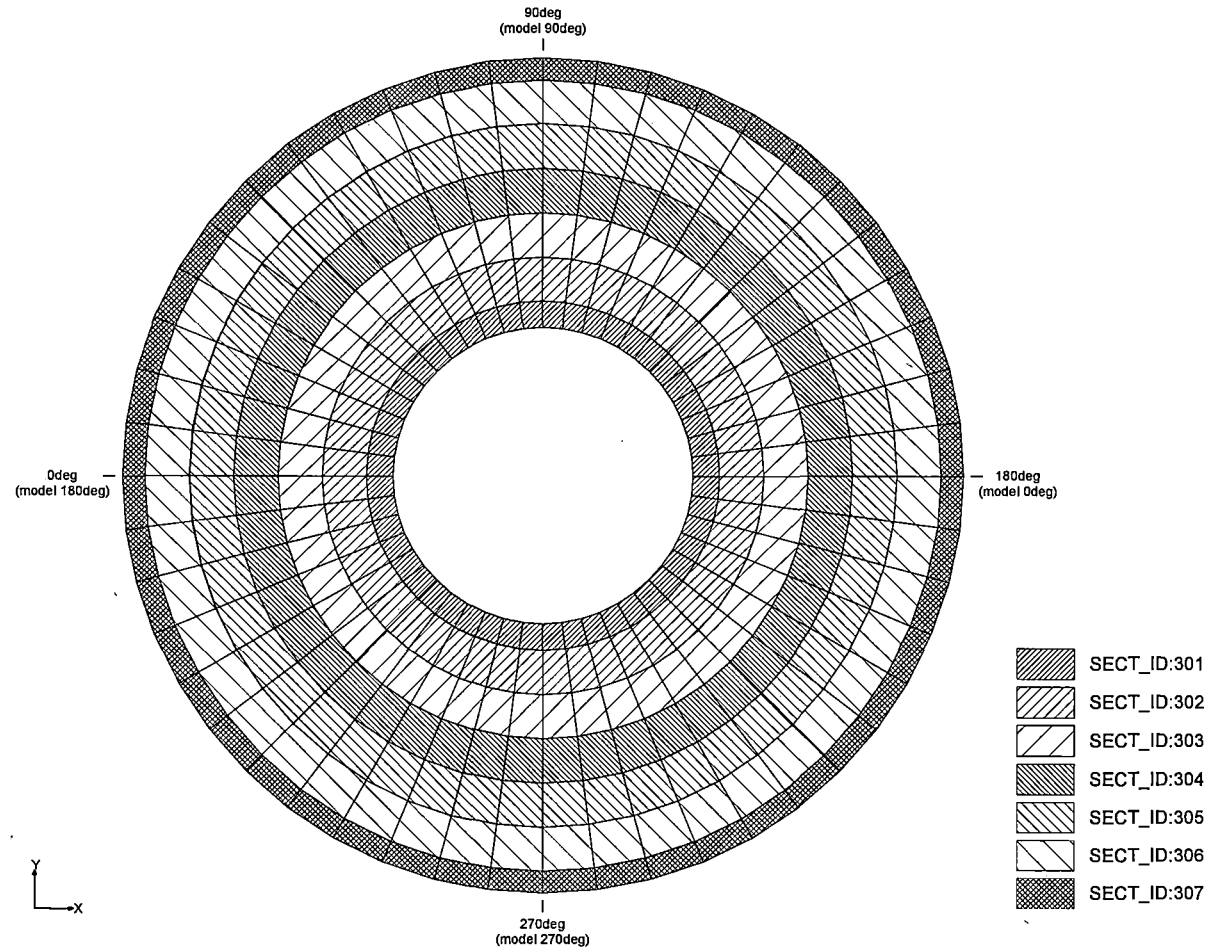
Reinforcement Provided in Elements (Suppression Pool Slab)
